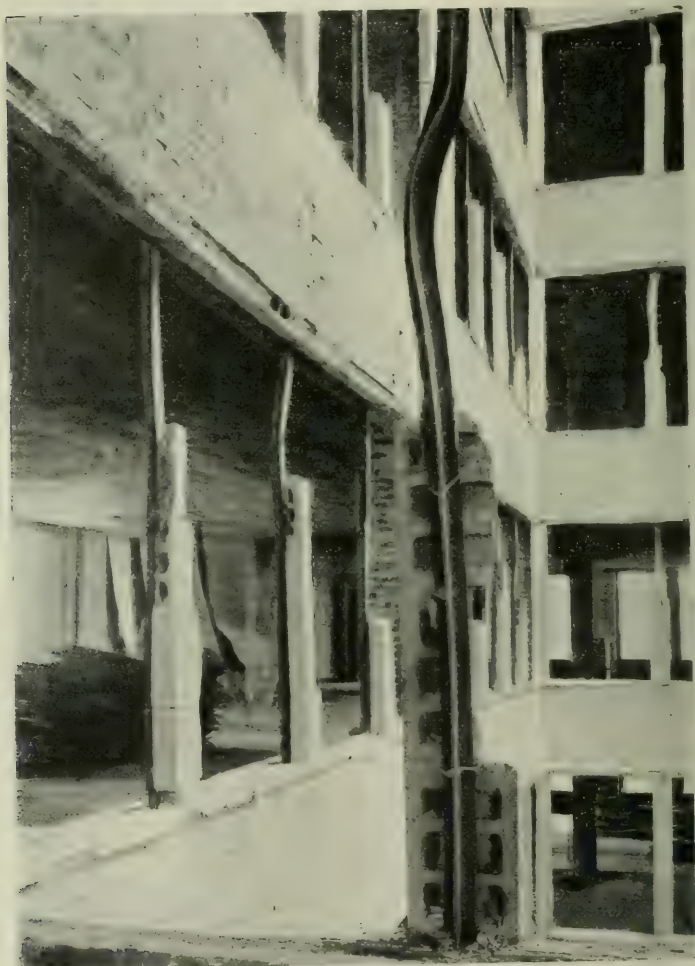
Merchants' Exchange Building, San Francisco. Spalling of Enamelled Brick Facing of Light Well and Failure of Clay-Tile Fireproofing of Window Frame Separator.
